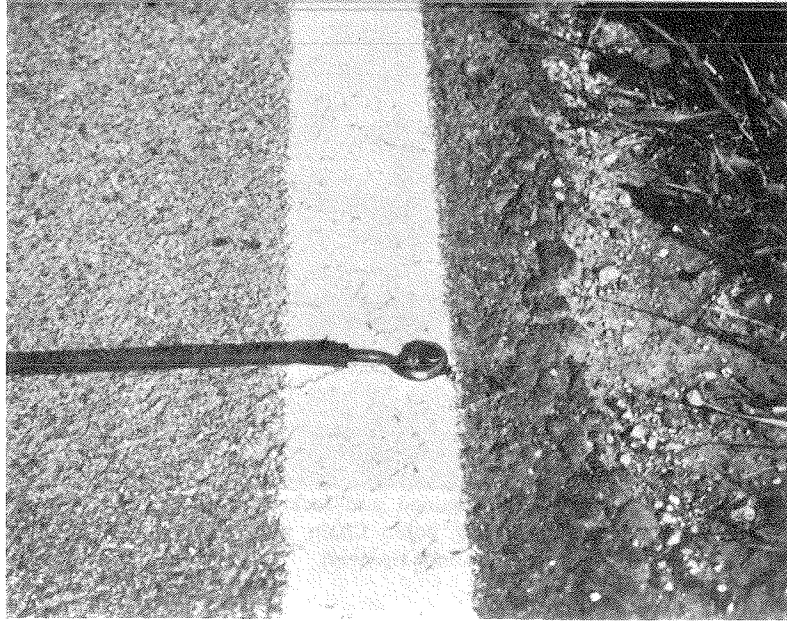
Detail View Showing Chicago Eyebolt and Roadtube Anchored With Spike Nail at Far-side of Pavement.
